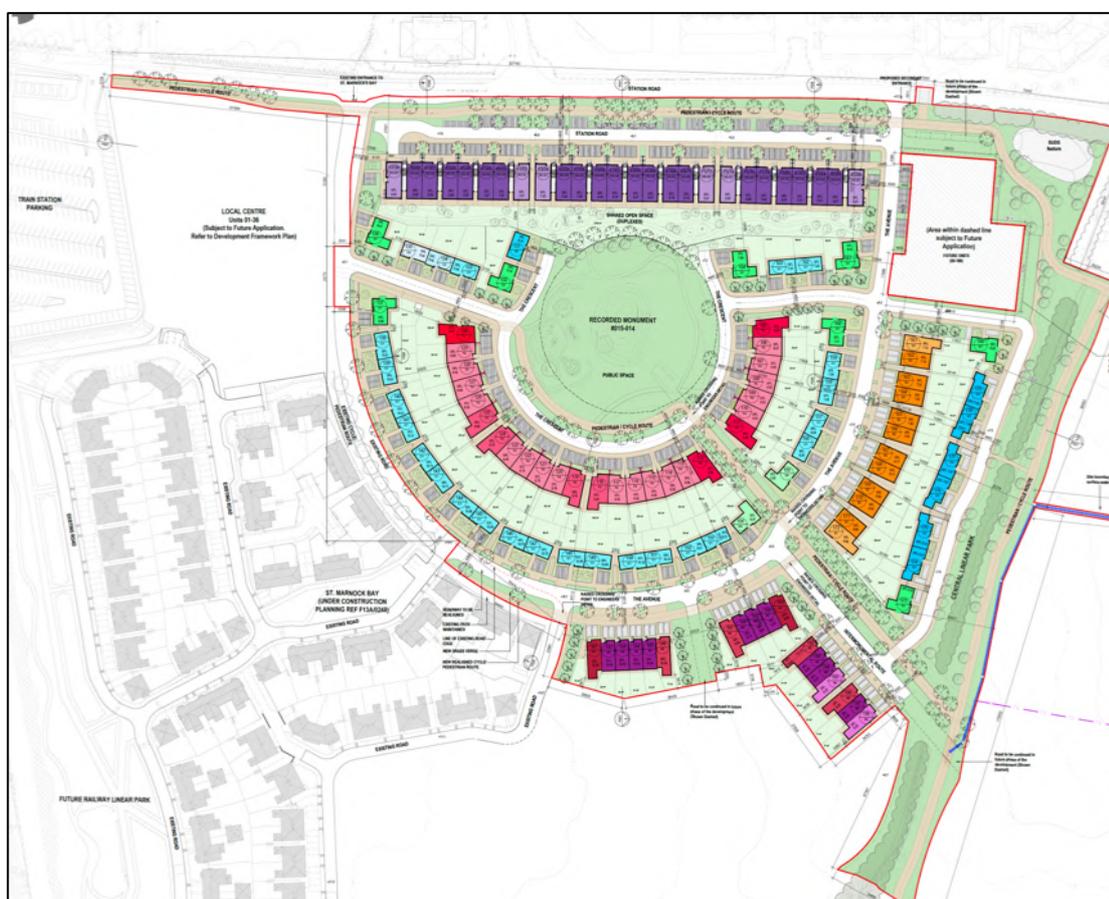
Extract from Site Layout Plan submitted as part of ABP Ref.: ABP-300514-17 (i.e. Phase 1B).
